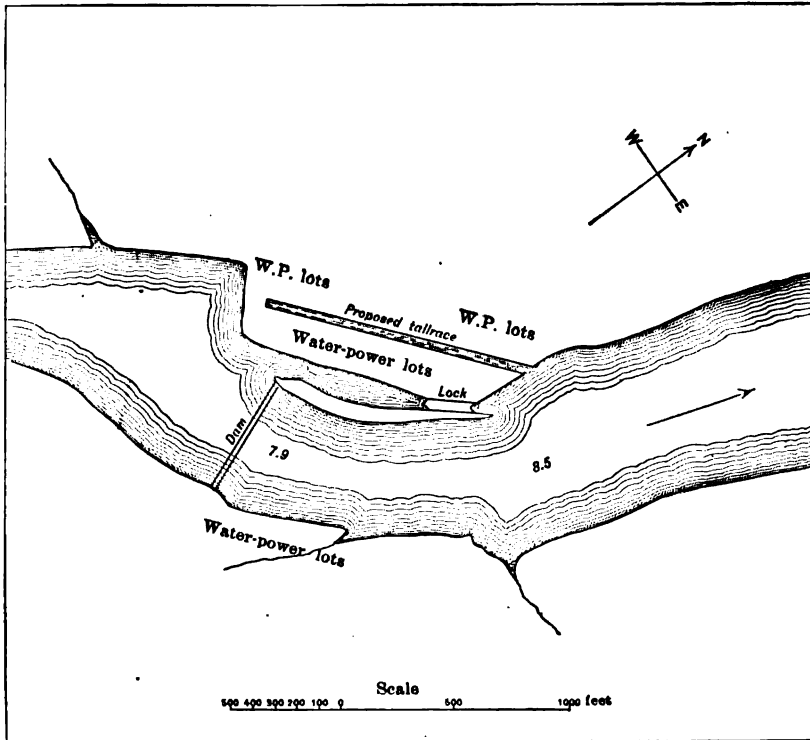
Plan of water-power development at Little Kaukauna, Wis.
